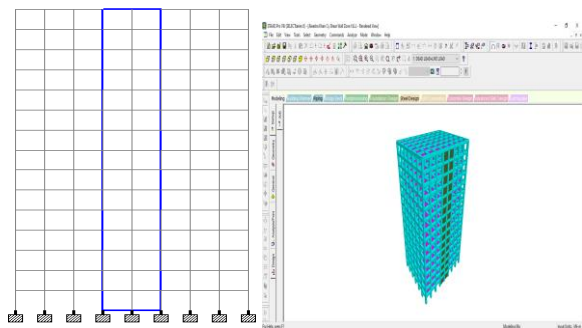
Framed building with Shear wall at the exterior side along Z-direction, Zone- III & IV
